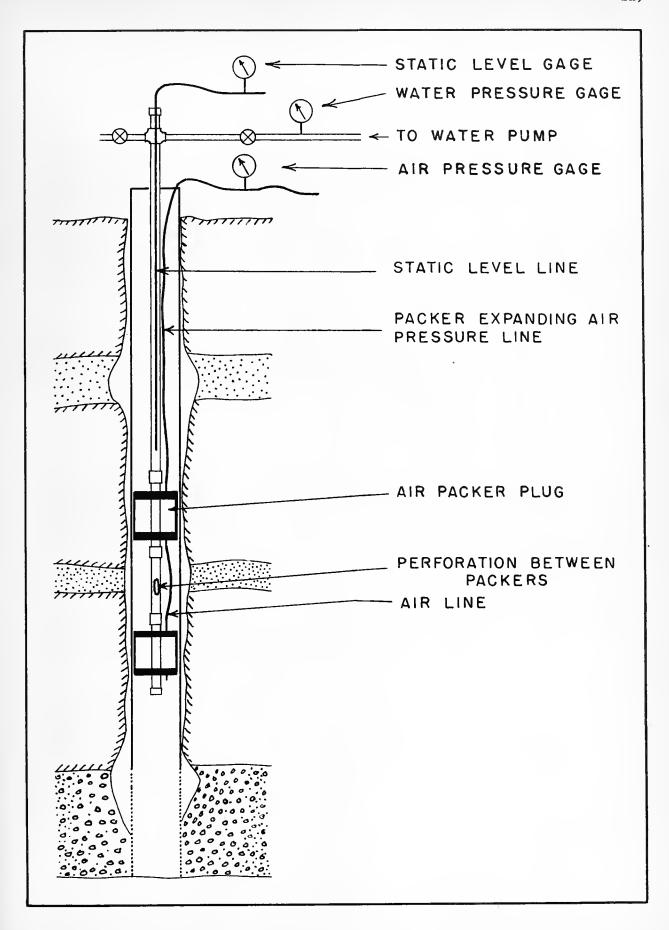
Arrangement for Using a Double Air Packer Plug to Test a Well.
